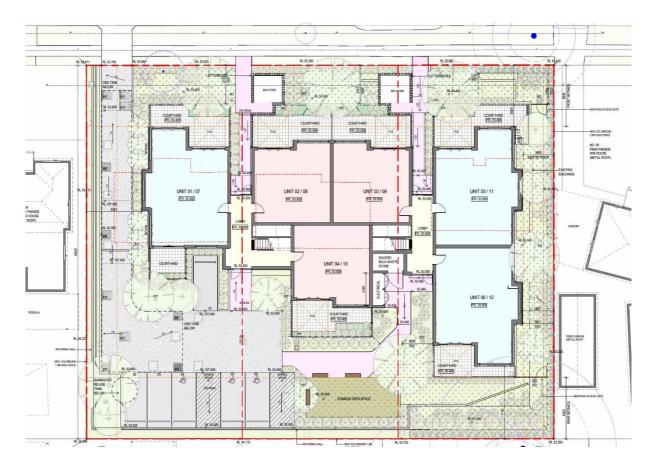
Extract from Architectural Plans - Site Plan (Source: Architectural Plans, Mode Design, dated 13.06.2023)
